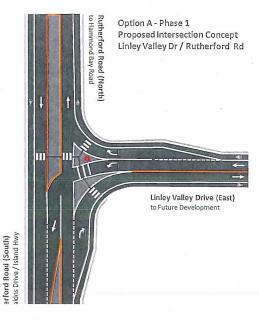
Option A / Phase 1 - Proposed Interim Intersection Configuration Rutherford Rd @ Linley Valley Drive
